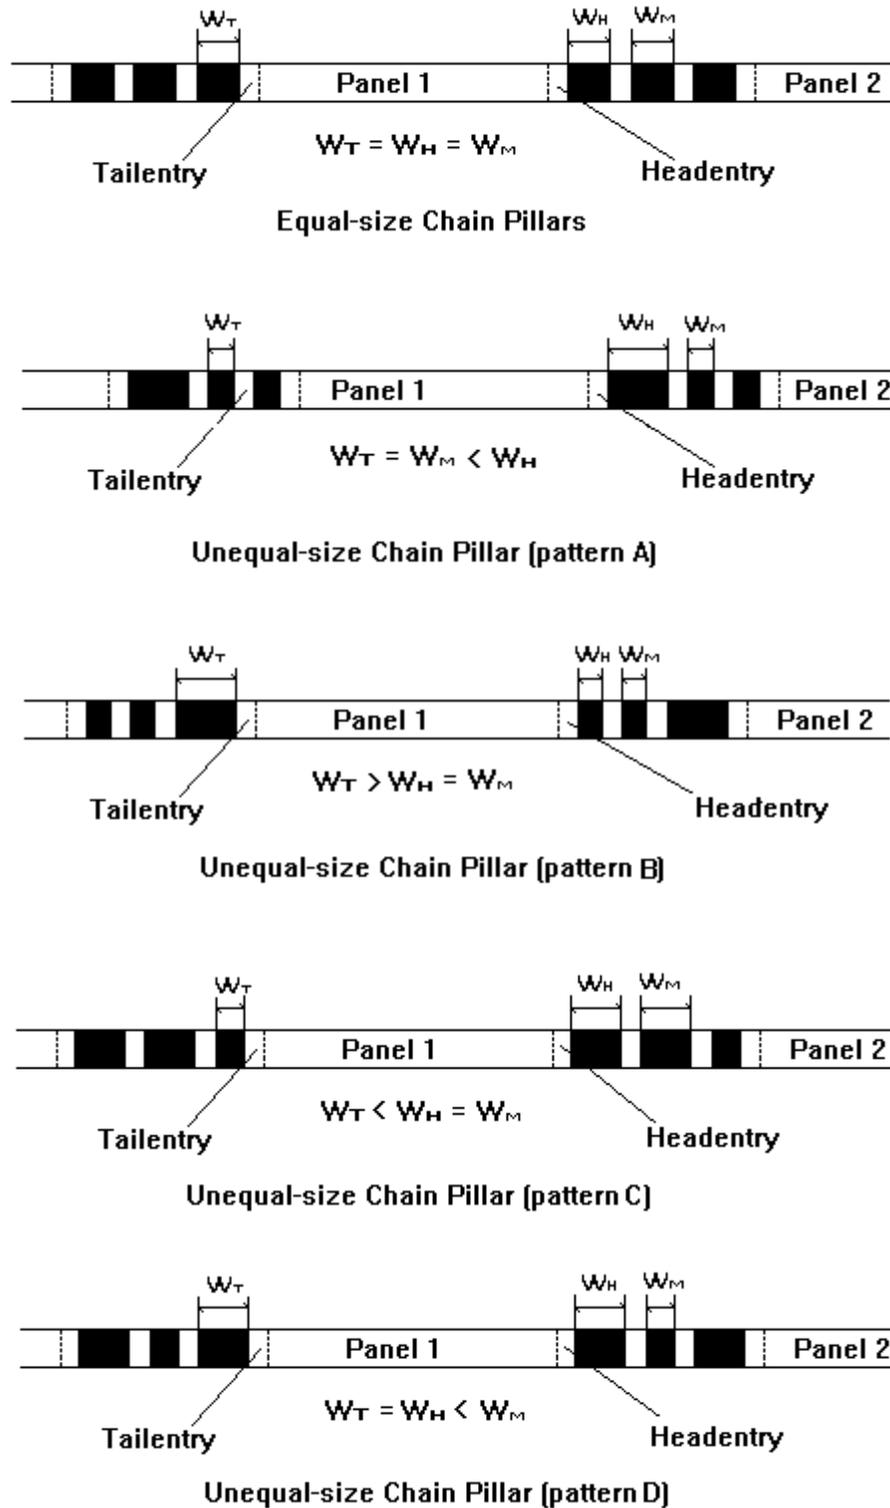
Some chain pillar arrangements in four-entry system (After Peng, 1986)
